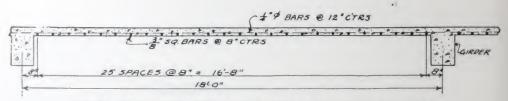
Section through girders and slabs showing typical bar design or slabs.
